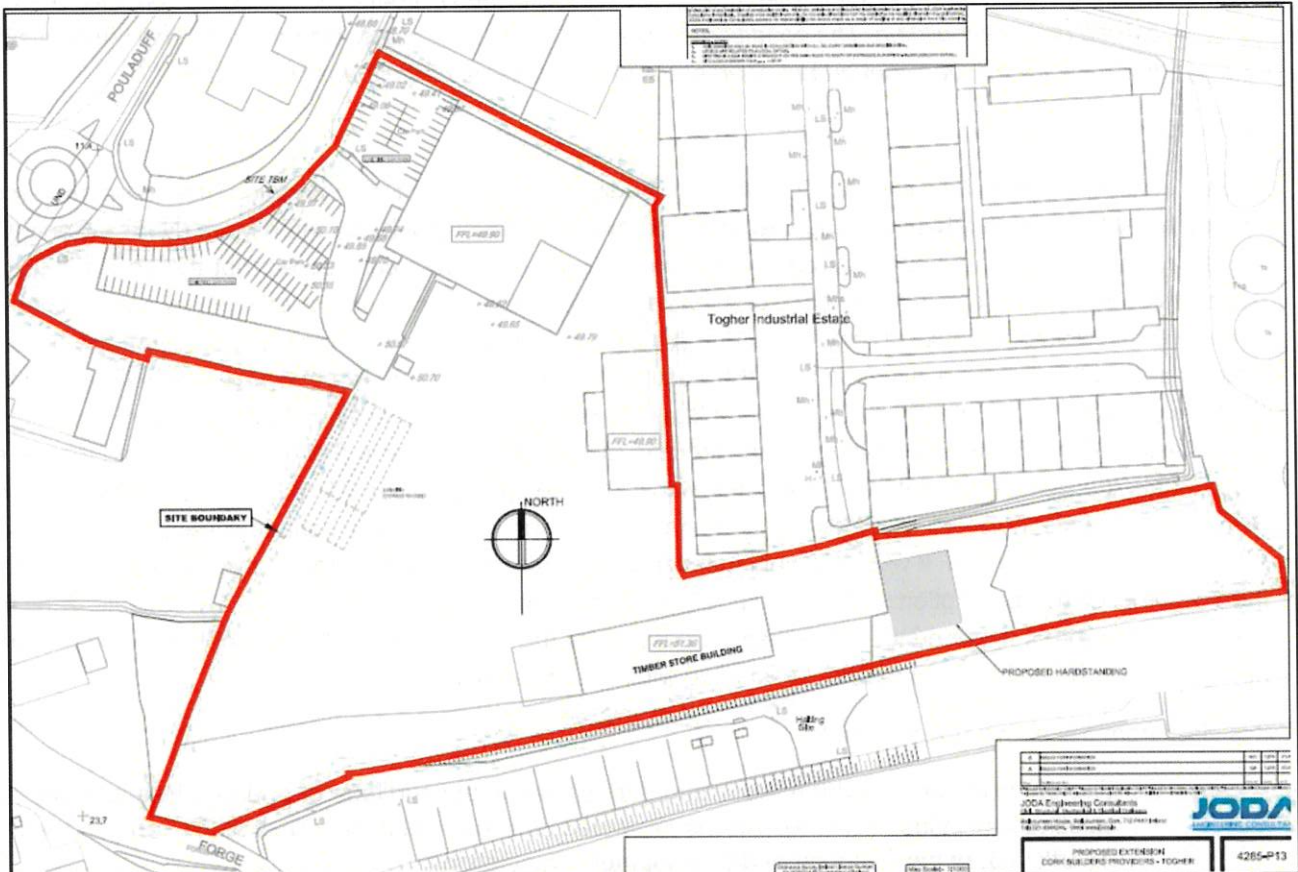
Location of proposed hard (i.e. concrete) surface area outlined in grey.
